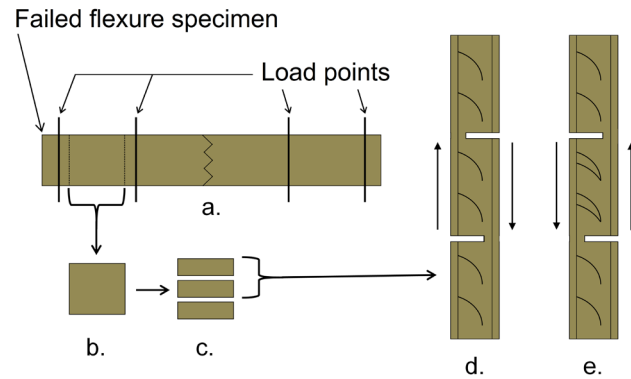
Tensile-shear test specimens: (a) failed flexure specimen showing locations of loading during test; (b) removed portion between loading locations; (c) removed portion cut into sized coupons; (d) tensile-shear specimen notched so lathe checks are pulled closed; (e) tensile-shear specimen notched so lathe checks are pulled open.
